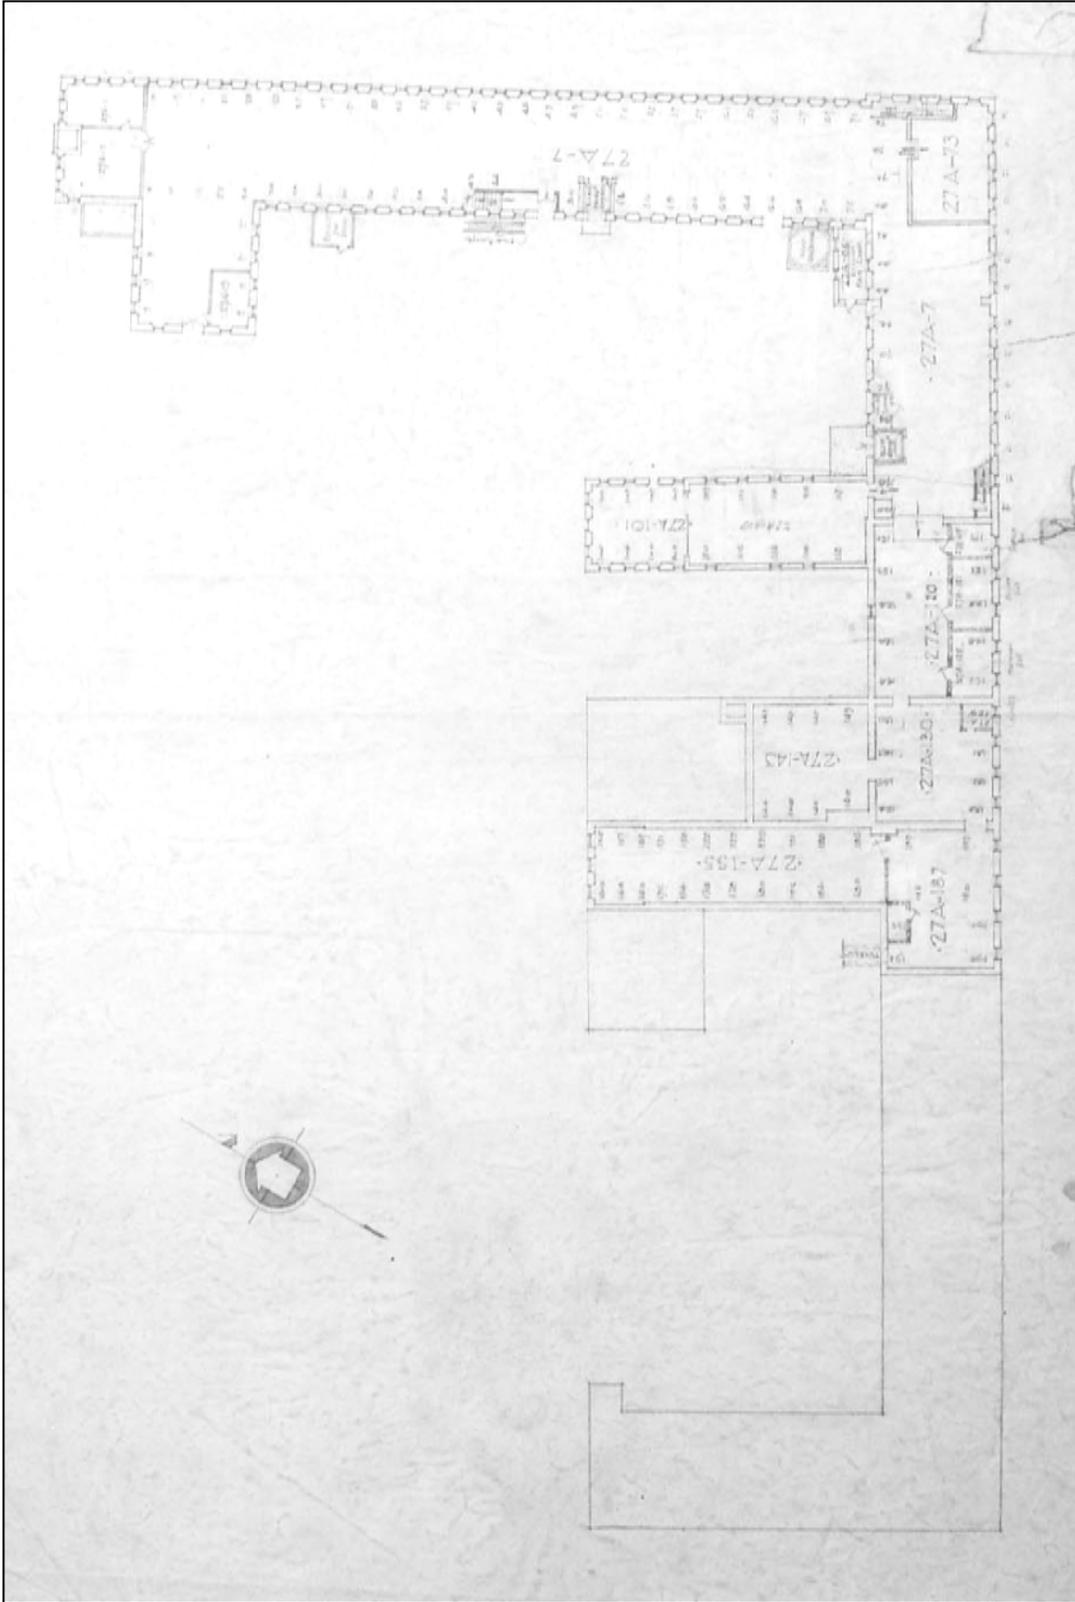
Building No. 27, Floor "A," Basement Floor Plan, March 1, 1941 with revisions through 1955; not to scale.
